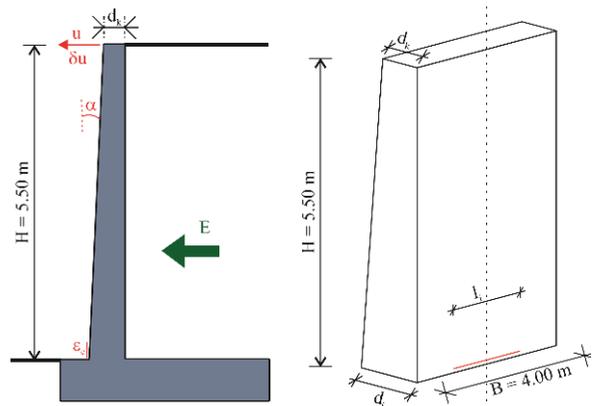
Schematic figure of the investigated cantilever wall (Rebhan et. al.)
